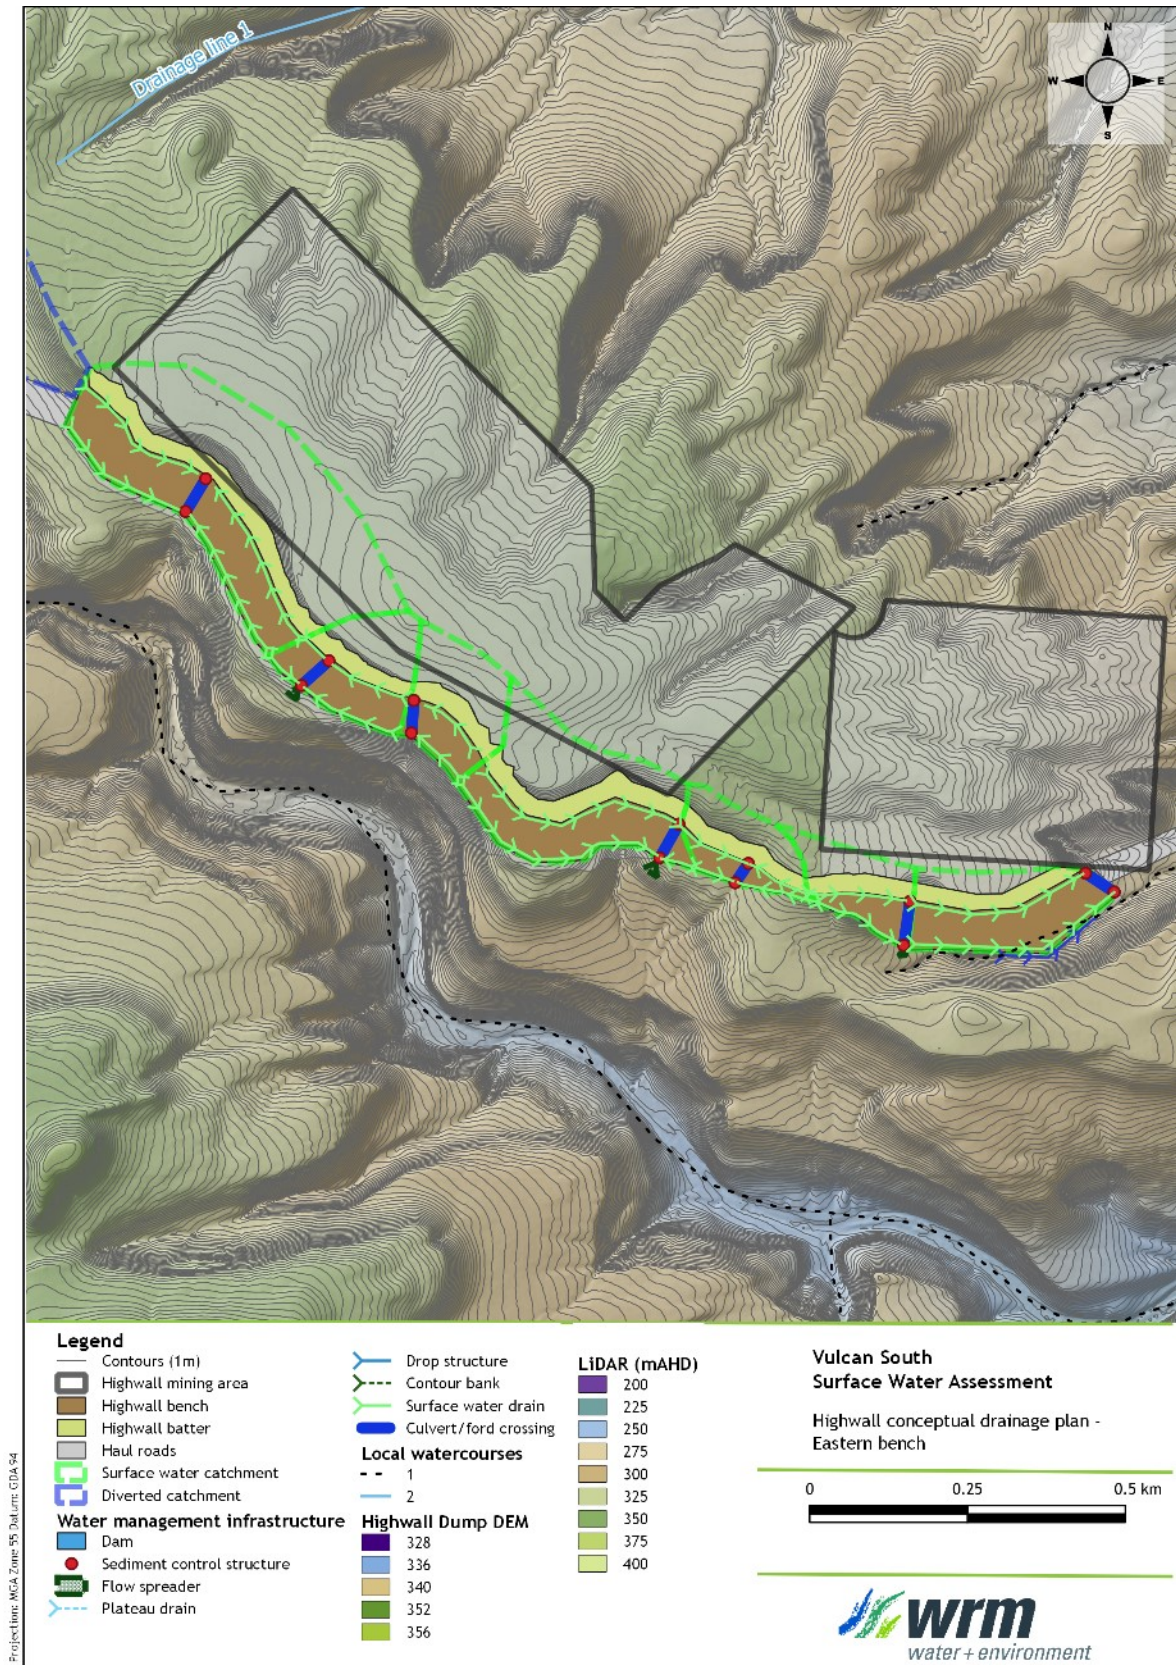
Highwall eastern bench mining area conceptual drainage plan (Year 2024)
